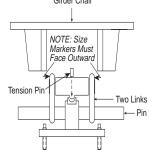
Links, Pin, Tension Pin, and Girder Chair Assembly
